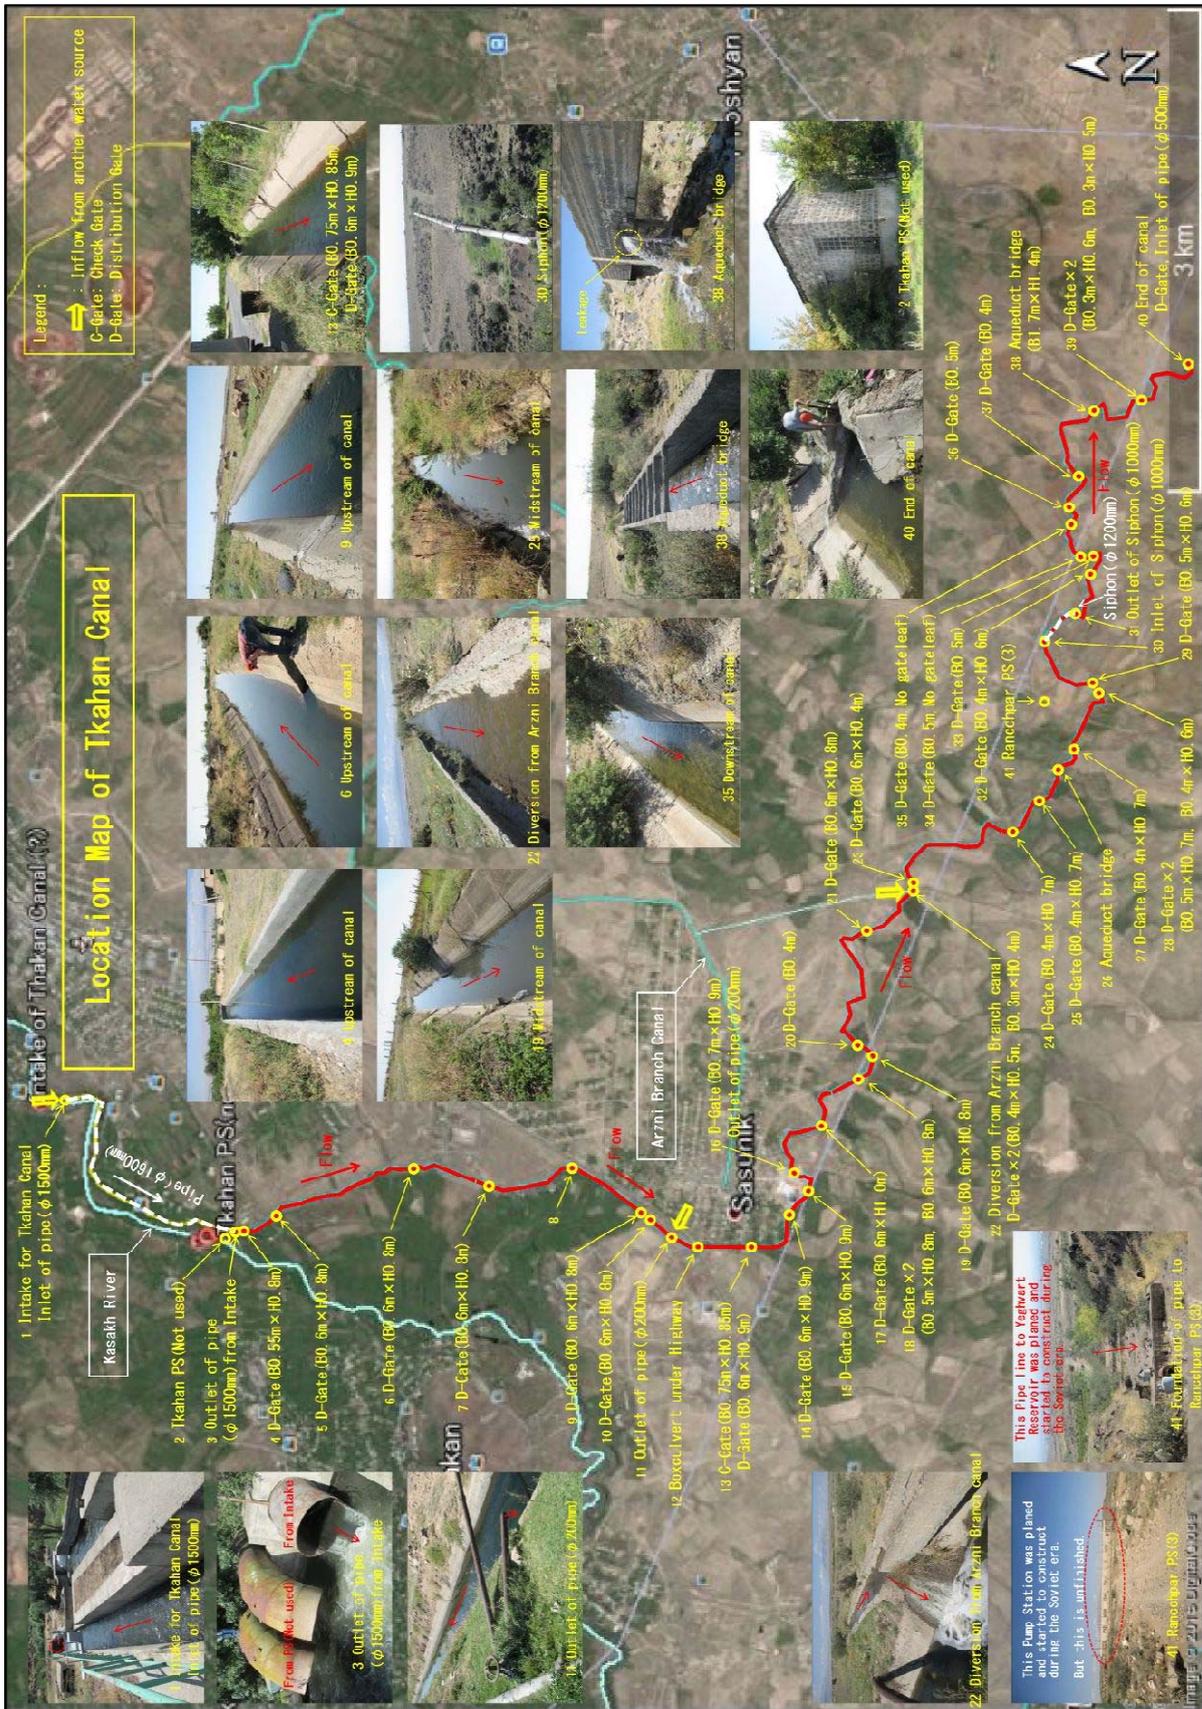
Location of the Irrigation Facilities of Takahan Canal
